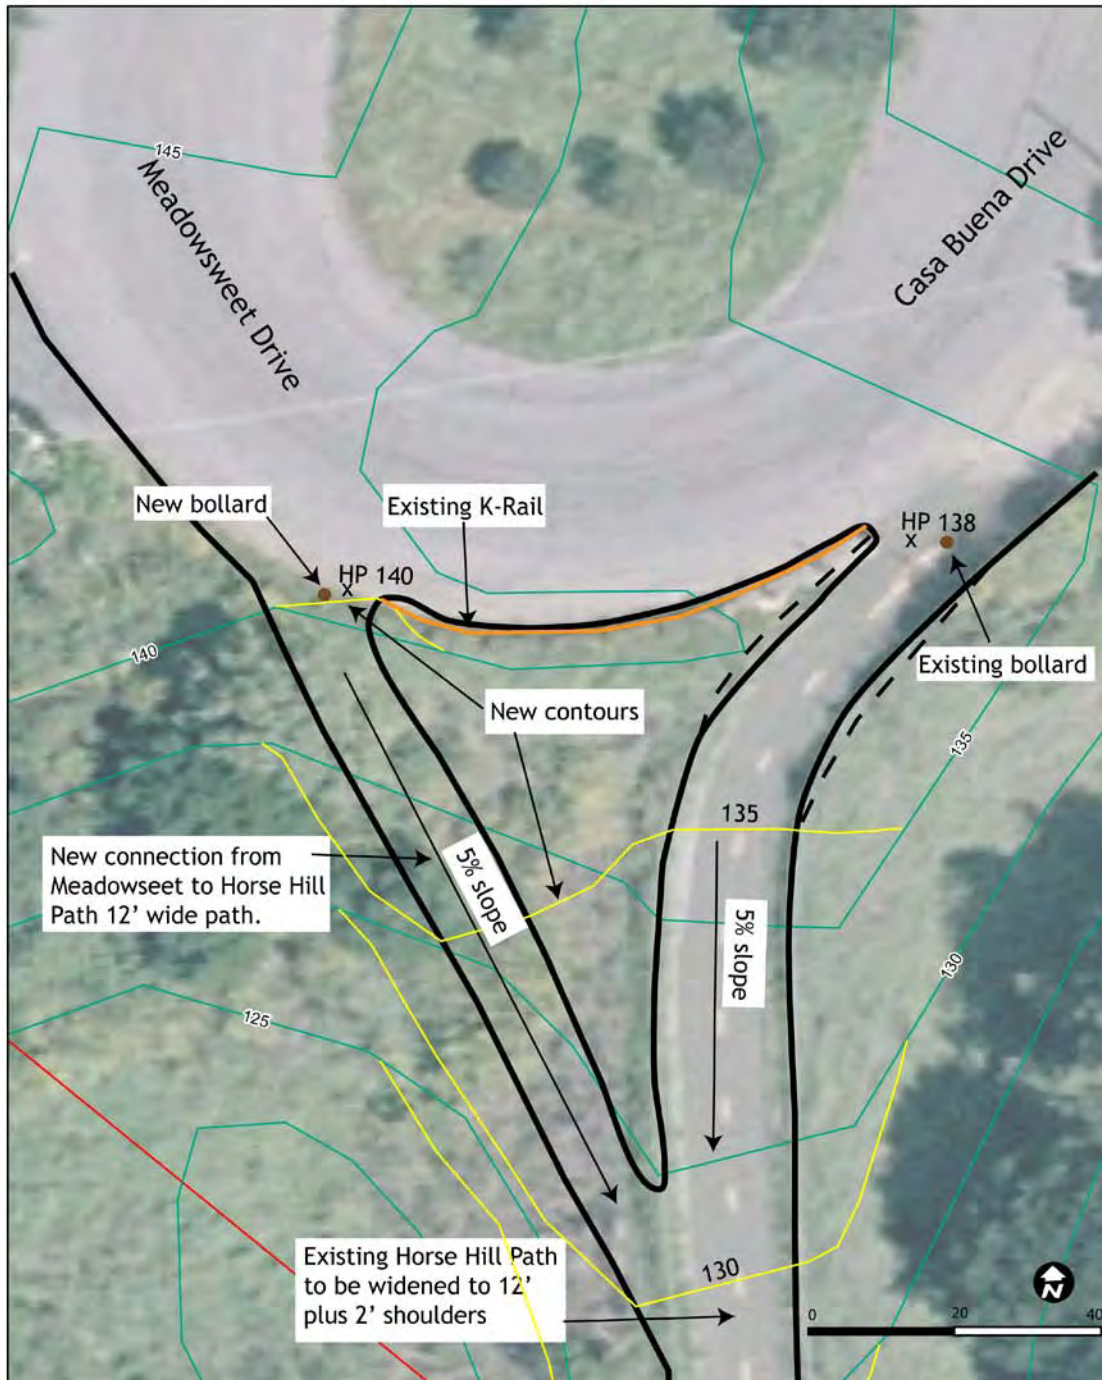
Conceptual plan of new path connection to Meadowsweet
